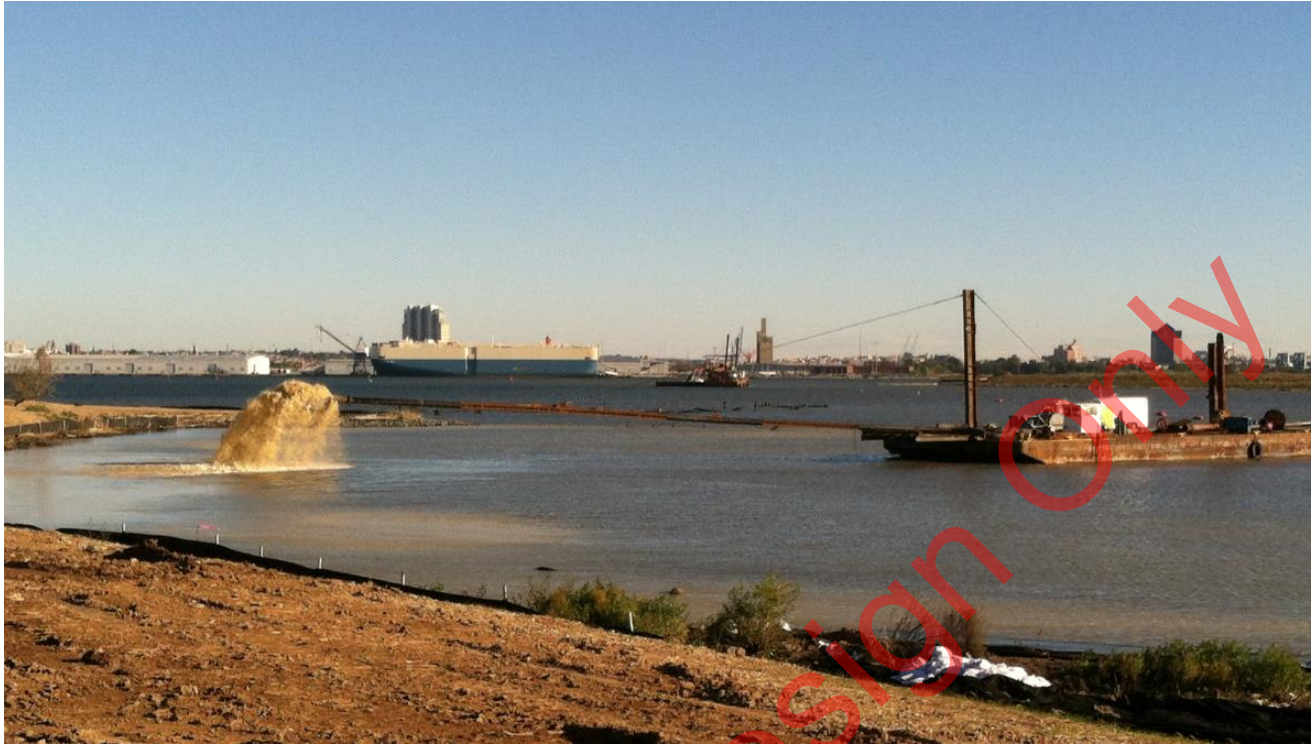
Hydraulic Sand Capping Using Upturned End and Baffle Plate at End of Pipe
